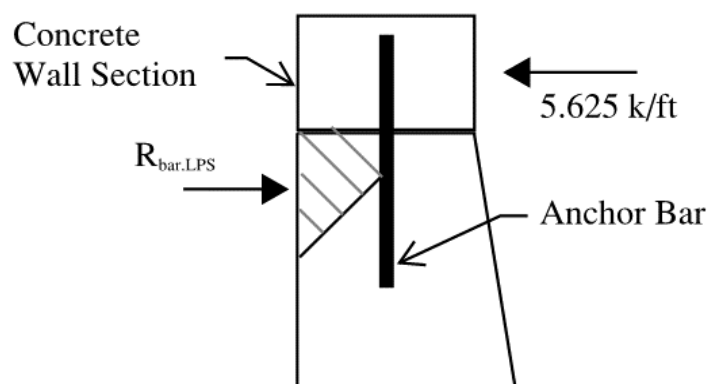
Lateral Punching Shear (LPS) Failure Mechanism.
